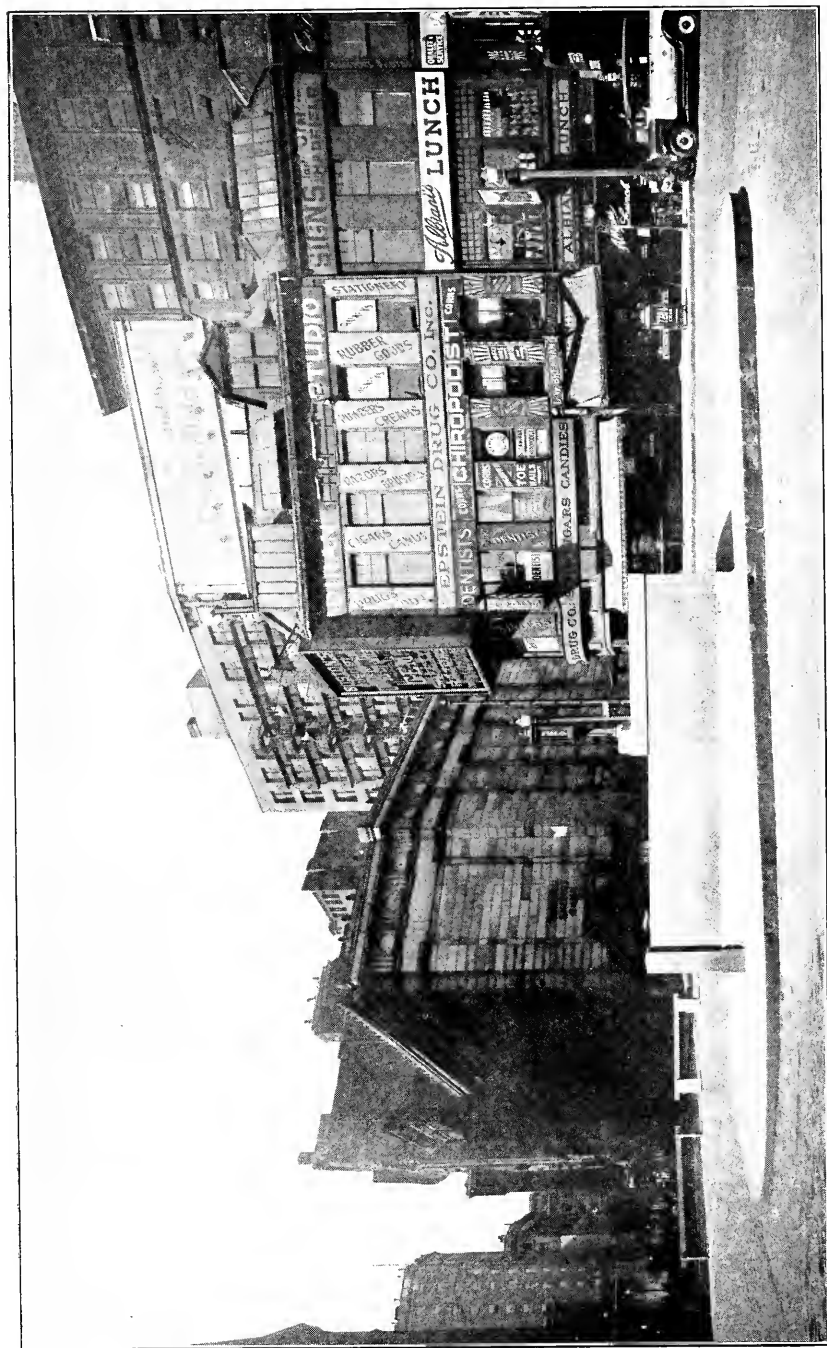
PLATE XVI.—NEW STRUCTURE OVER STAIRWAY, SCOLLY SQUARE STATION.
